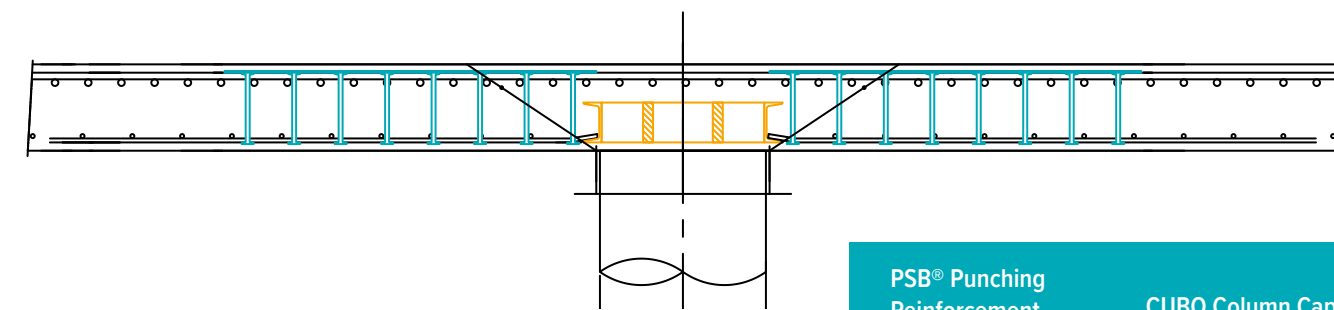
FLAT SLAB CROSS-SECTION THROUGH THE COLUMN AT ÖBB HEADQUARTERS.
